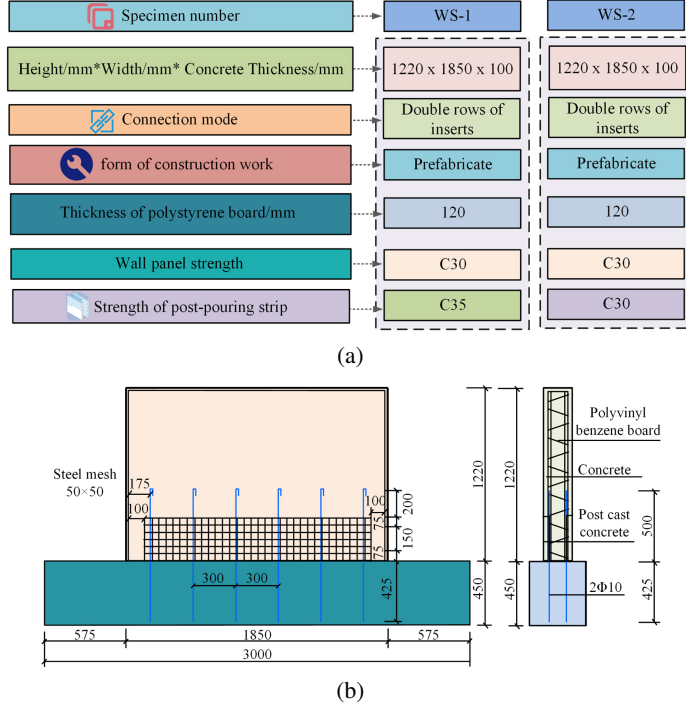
Design parameters and detailed structure diagram of cast shear wall specimen; (a) Parameters of post-cast shear wall specimen, (b) Detailed construction diagram of WS-1 and WS-2
